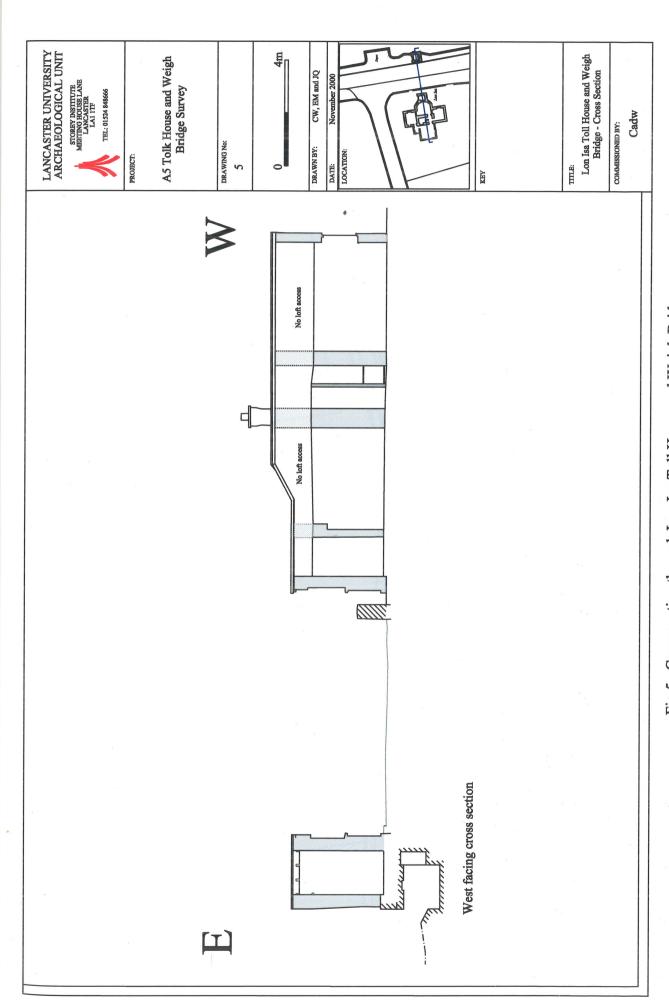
Cross section through Lon Isa Toll House and Weigh Bridge
